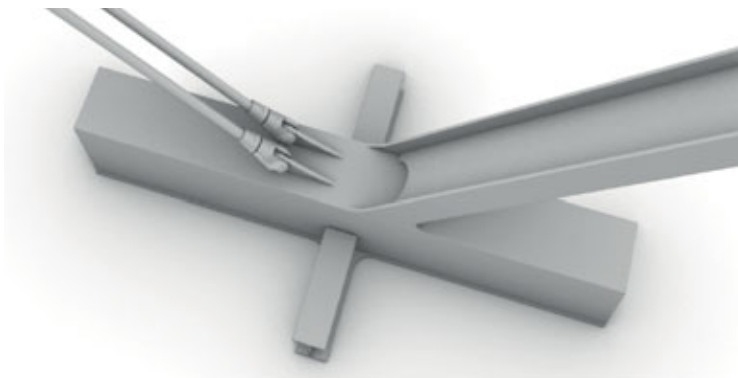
Detailed 3D study of a typical joint detail involving the connection of twin tension rods to the bottom chord of the truss (credit: © bEST Ingénieurs Conseils)
